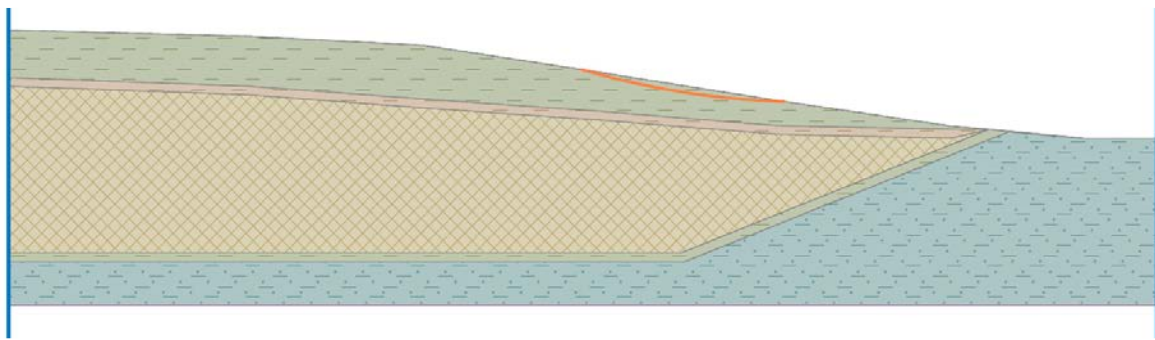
Section 2-2, $r_u=0.1$, shallow slump
